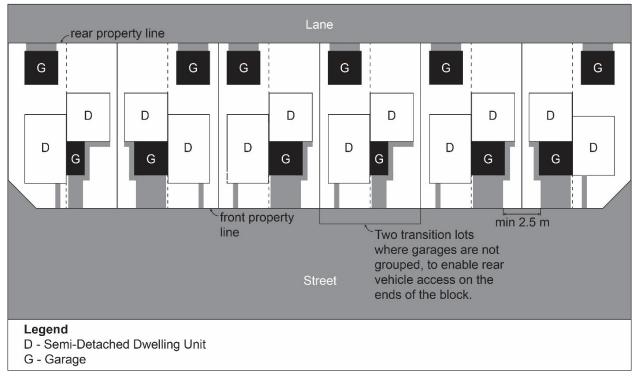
Grouping of Vehicular Access on Adjacent Lots for a Block of Semi-Detached Dwellings
